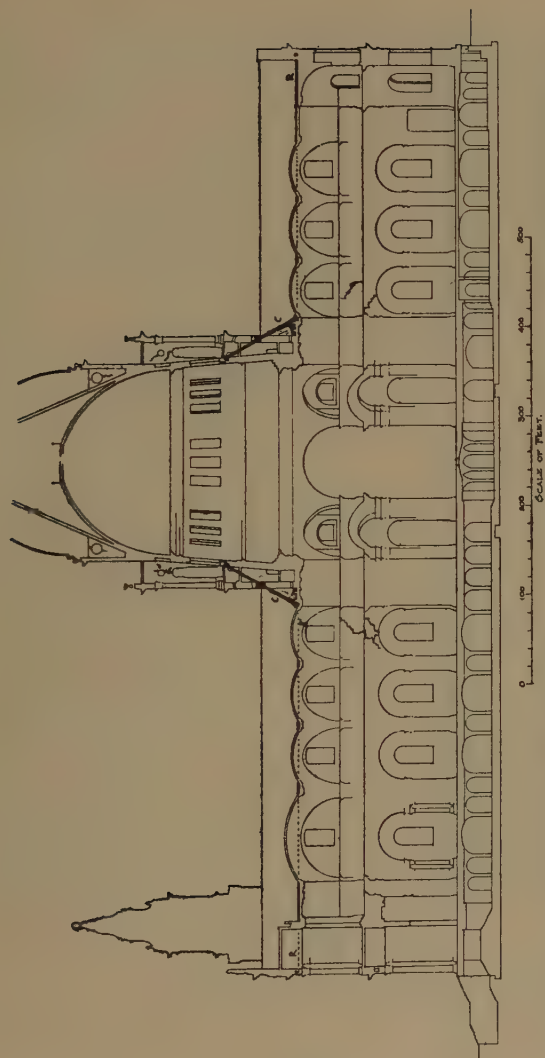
Long Section, St. Paul's Cathedral. Ragged lines show the positions of some principal dislocations of masonry. C=proposed cone, R=reinforced bands of concrete. The re-coring of the main piers cannot be indicated, but would be put in hand from the foundations right up to the bearing of the drums upon the great arches.
